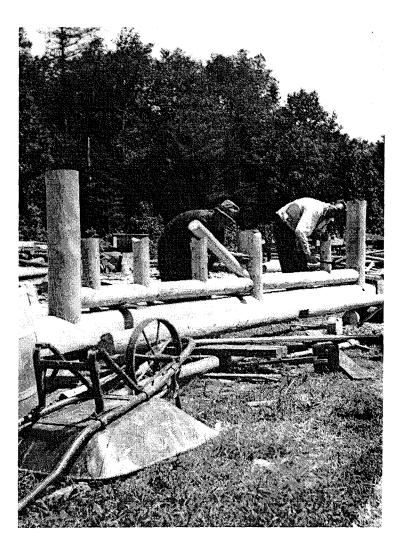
The frames for some larger bridges were prefabricated at the NP-2 carpentry shop. This bridge, built in 1935, was installed over a stream at the outlet of Great Pond. (NARA Photo, Project scan number 311)
